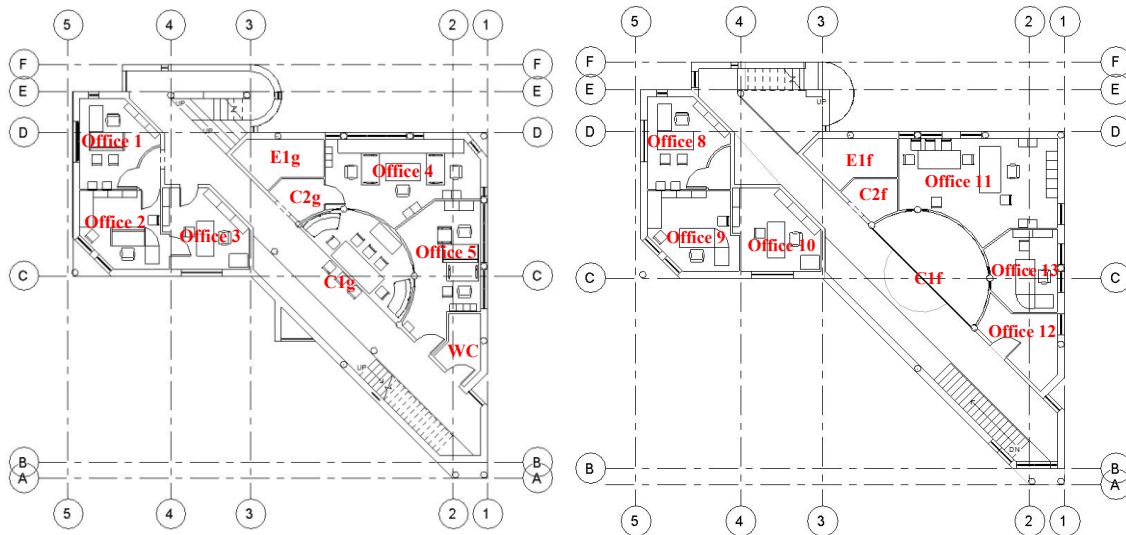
Ground Floor (left) and First Floor (right) Plan views
